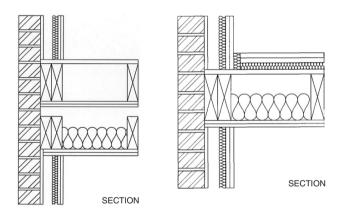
Stair treatment 1: Stair covering and independent ceiling with absorbent material
